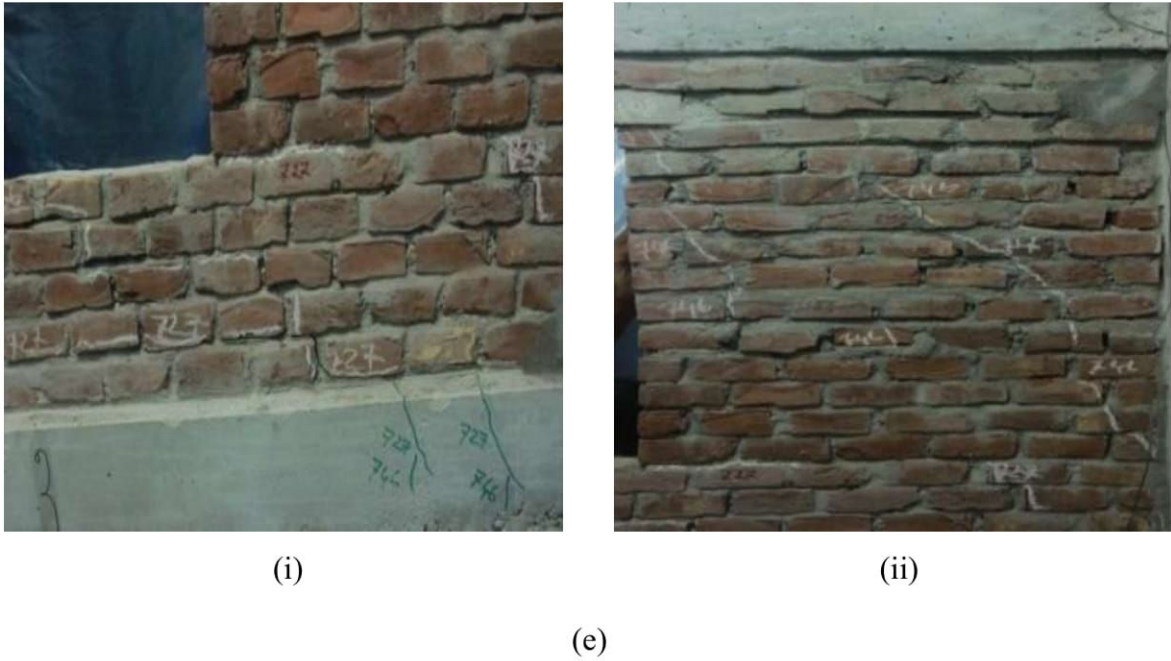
Specimen 3, Formation of cracks of two storied single bay infill frame having window opening
